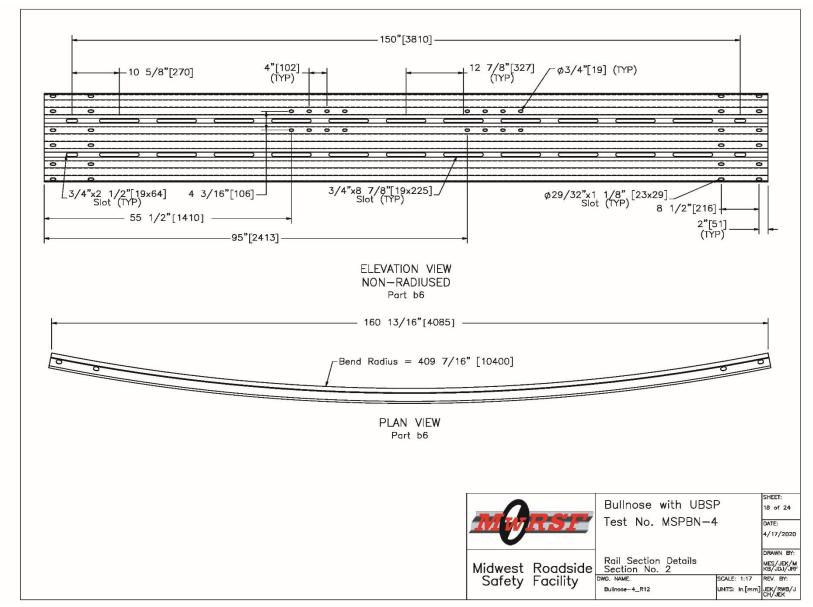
Rail Section Details Section No. 2, Test No. MSPBN-4
